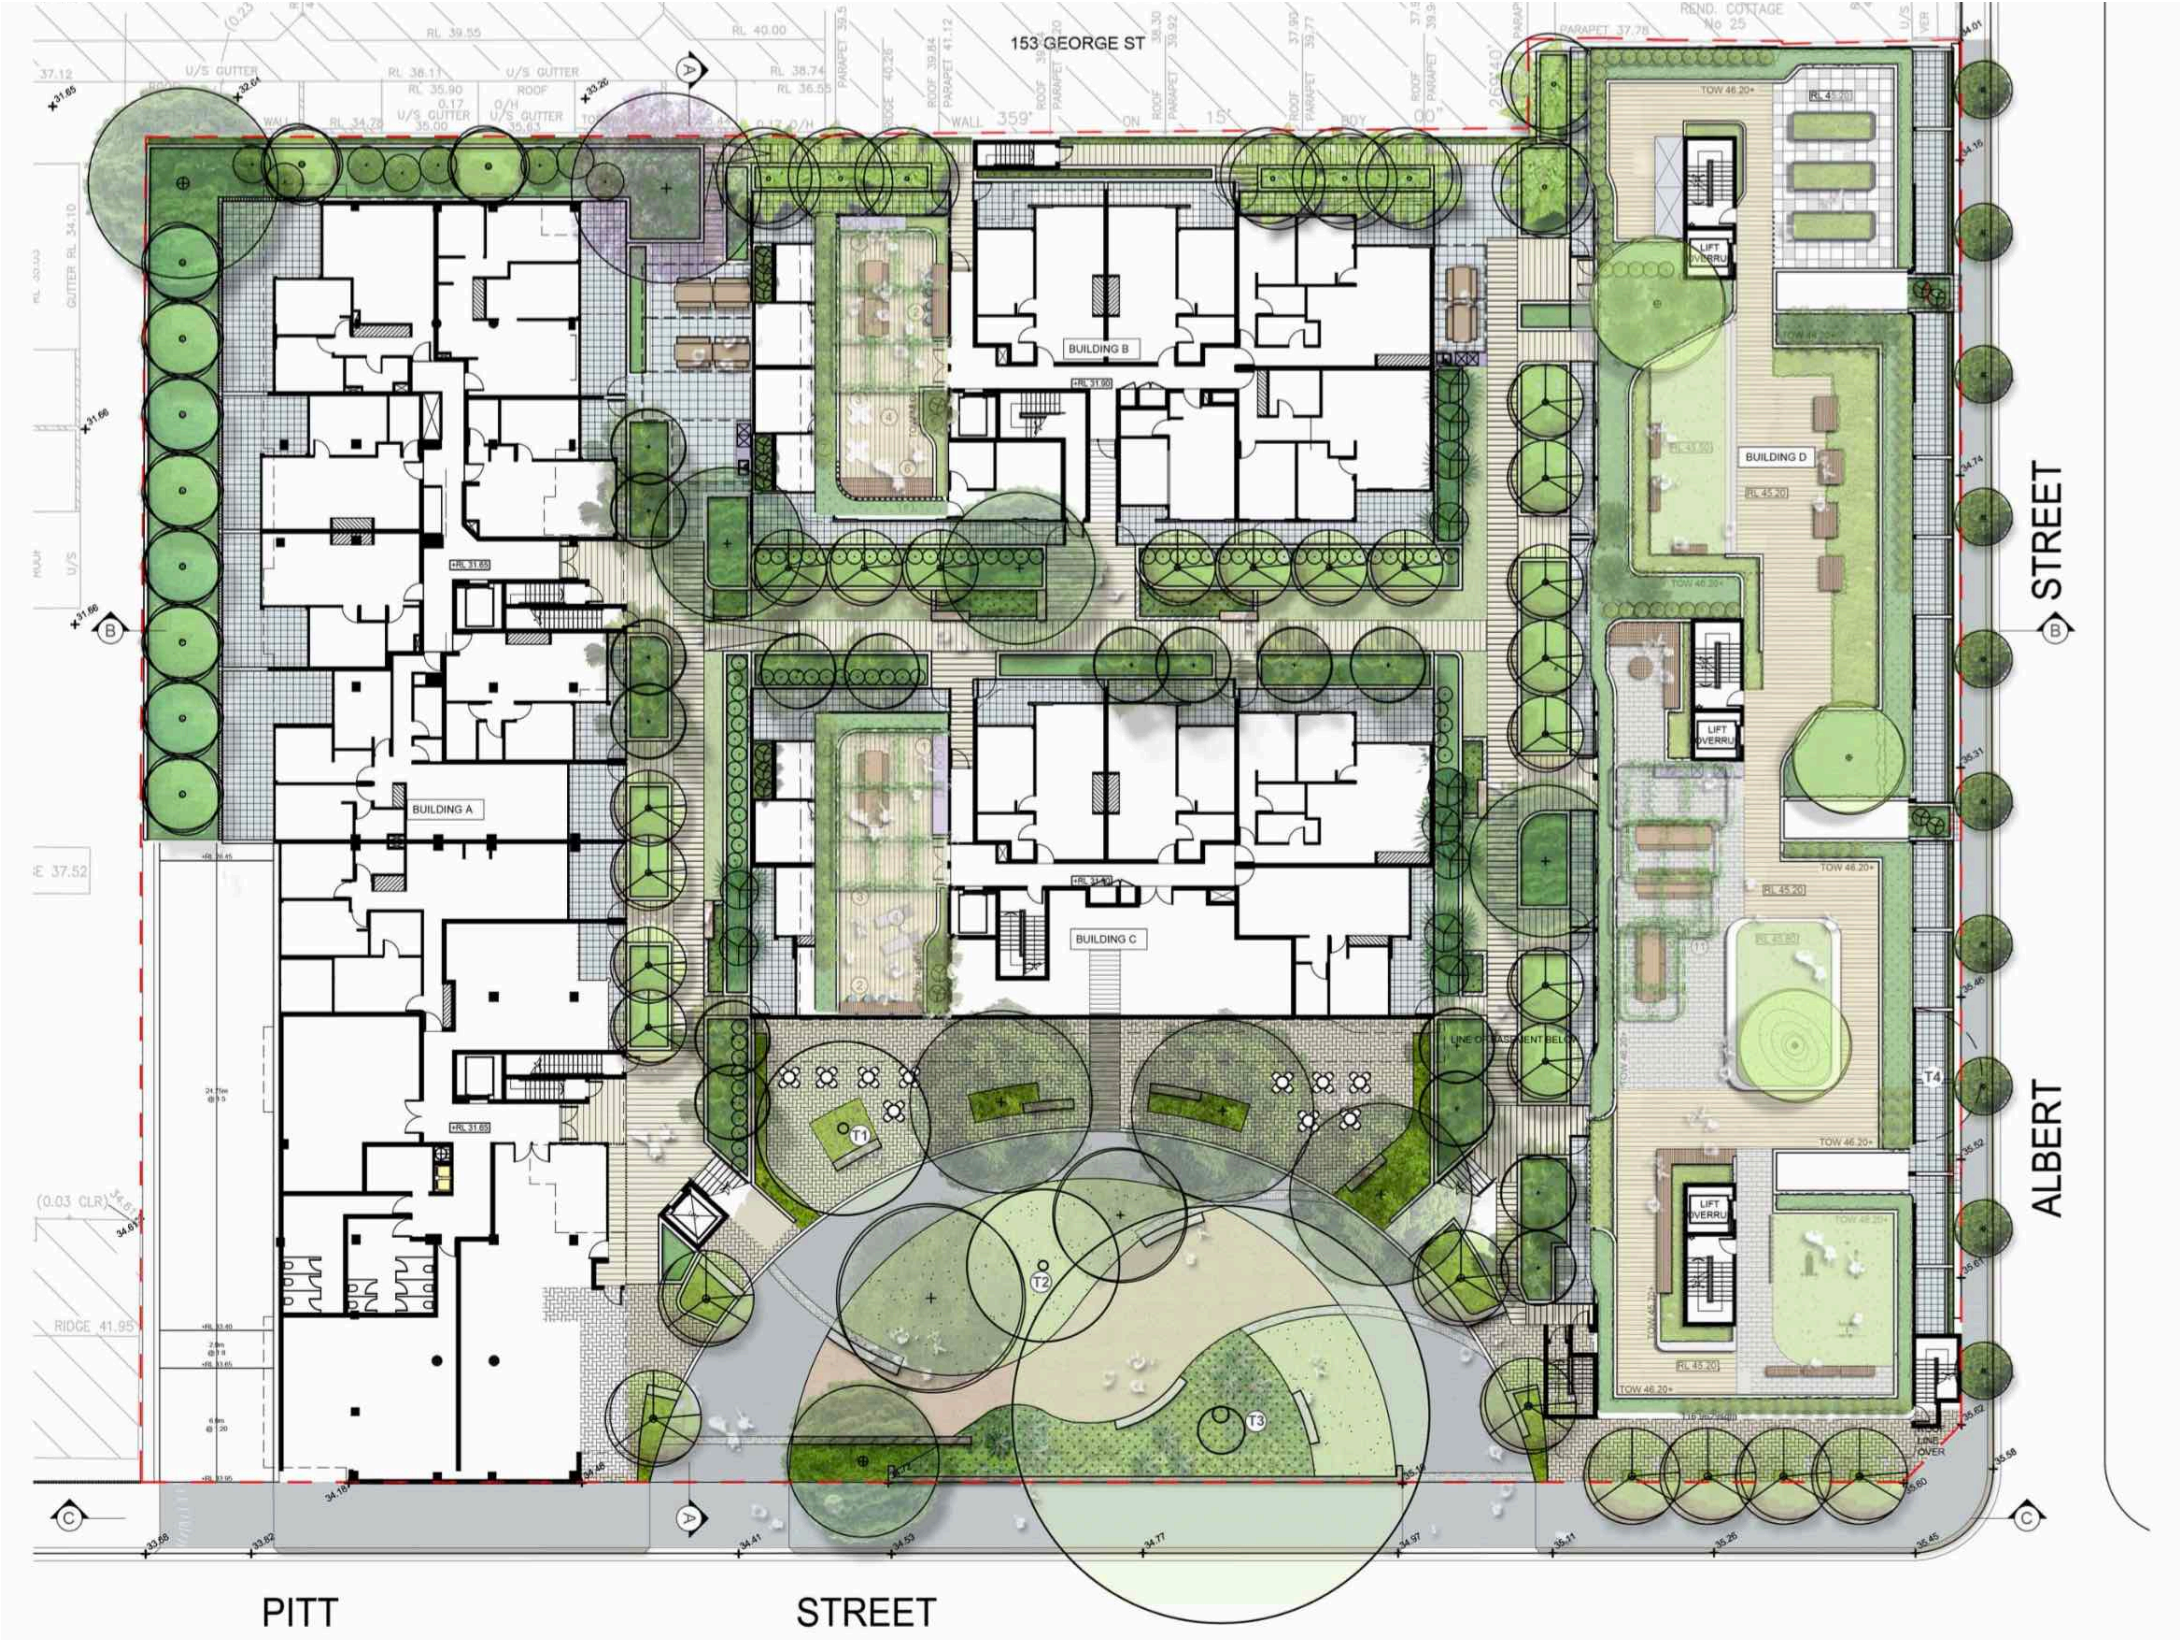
Extract from landscape plan illustrating improved arrangements for landscaping of the publicly accessible forecourt and communal open space provision upon available rooftops.
